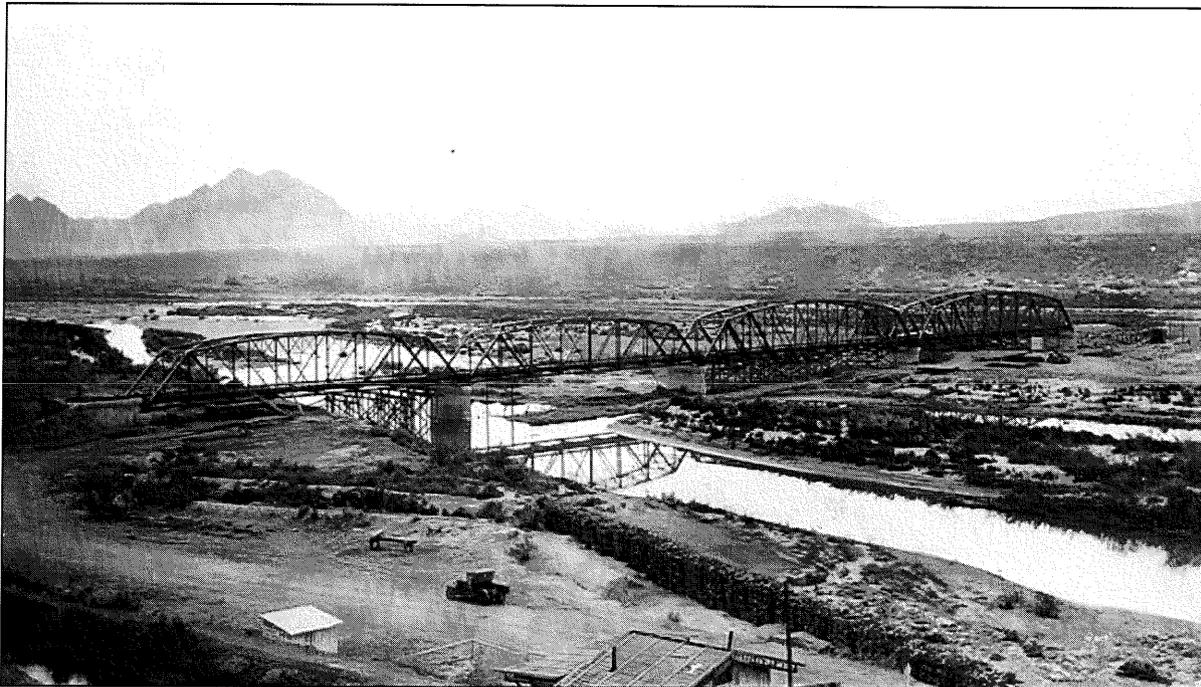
1926 photograph of ongoing construction of the bridge downstream from the dam (Arizona State Library, Archives and Public Records, Archives Division, Phoenix, No. 98-2360).
